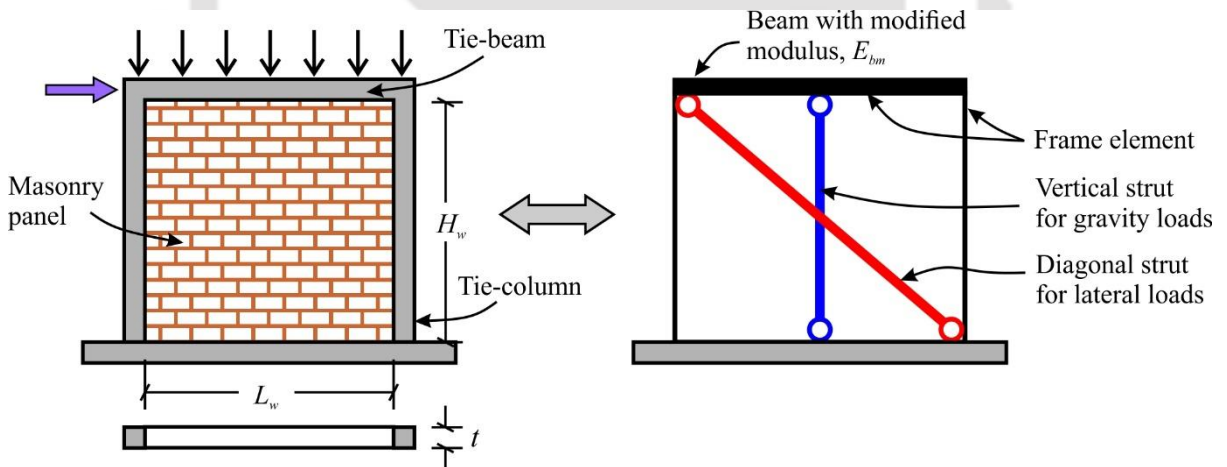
Typical CM wall and equivalent V-D strut model.
